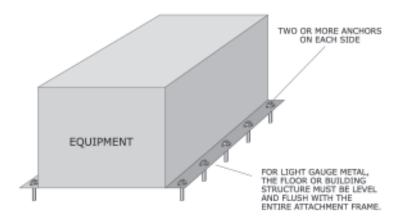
Direct attachment of equipment with sheet steel housing to a building.
